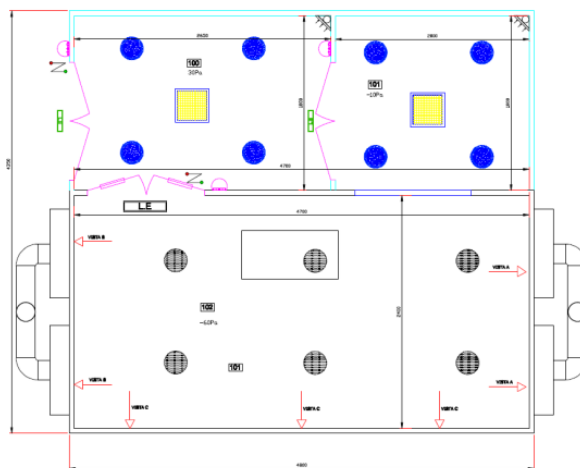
Nanoaerosol testing chamber prototype CAD drawing
